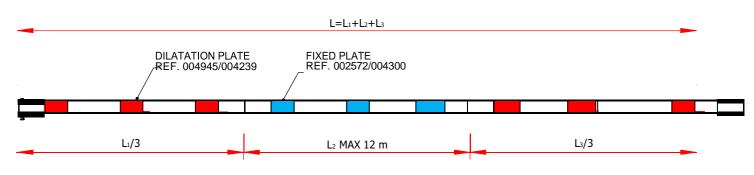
Example of arrangement of fixing plates
